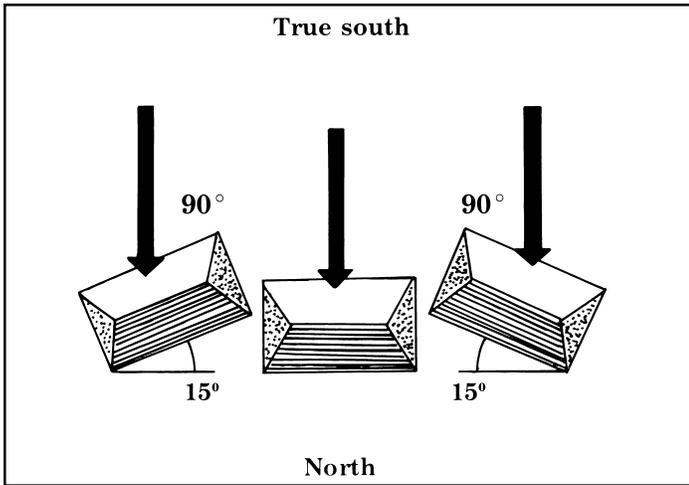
The south-facing wall can vary up to 15° either east or west of true south and still be effective for solar collection.
